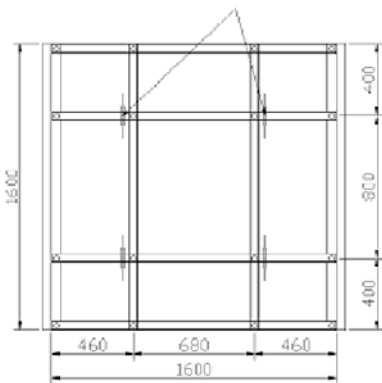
Schematic back-view of steel-framed facing (dimensions in mm)
